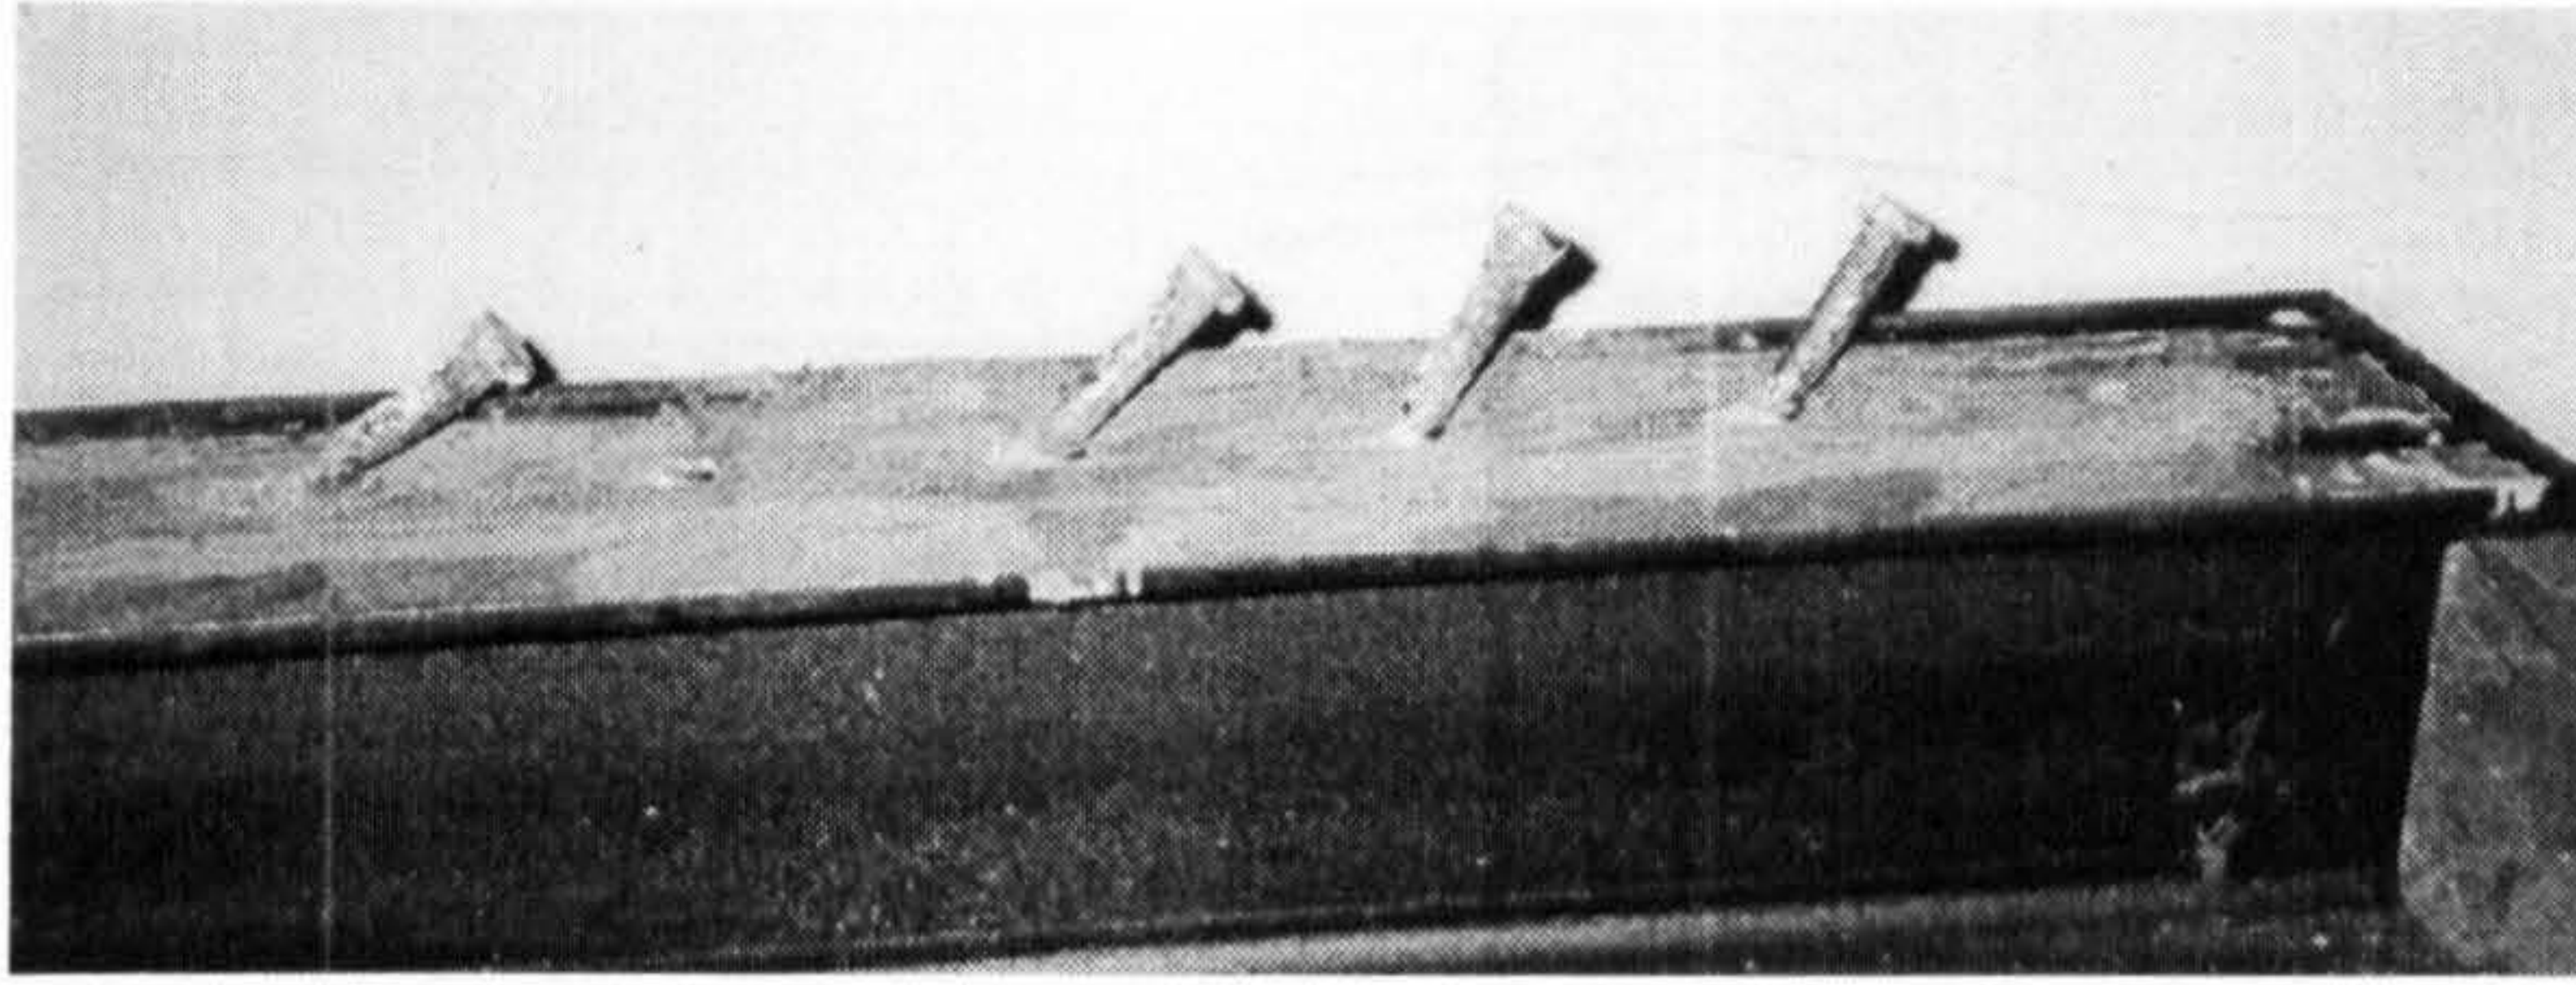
Shear studs for test specimen T 16-C30-200-60 after testing
